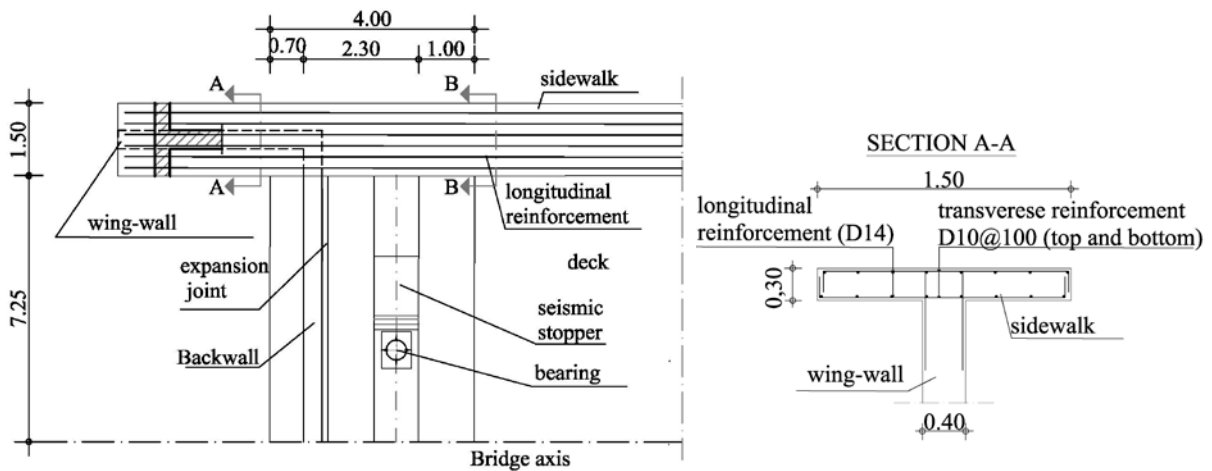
The connection of the sidewalks to the wing-walls (indicative dimensions)
